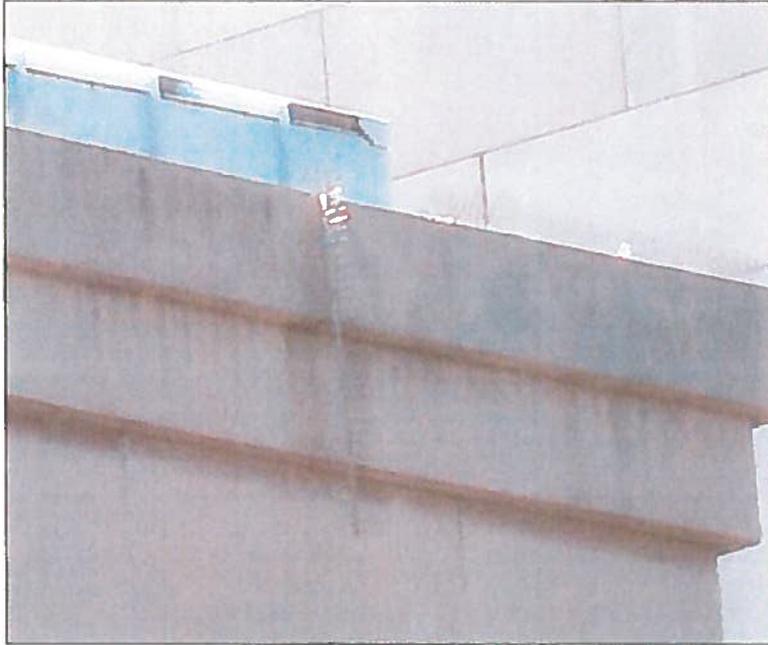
Loose Nixalite Bird Spikes bird control strips (typical all elevations).
